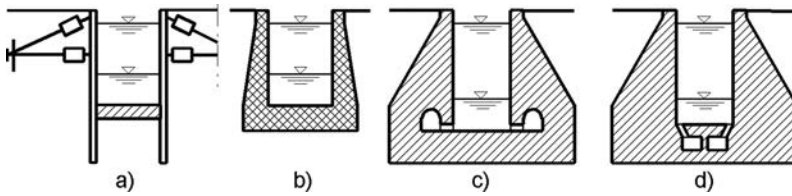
Cross-section of ship navigation locks (after Novak et al., 2001). (a) Anchored steel sheet piling; (b) reinforced concrete semi frame; (c) gravity walls with lateral longitudinal filling water conduits; (d) gravity walls with bottom water conduits.
